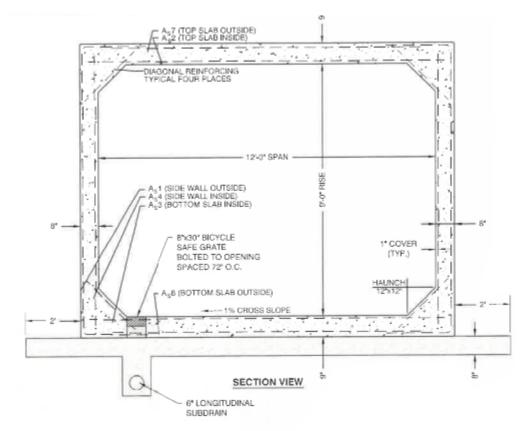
Typical section from existing plans showing 8" granular material and subdrain below culvert
